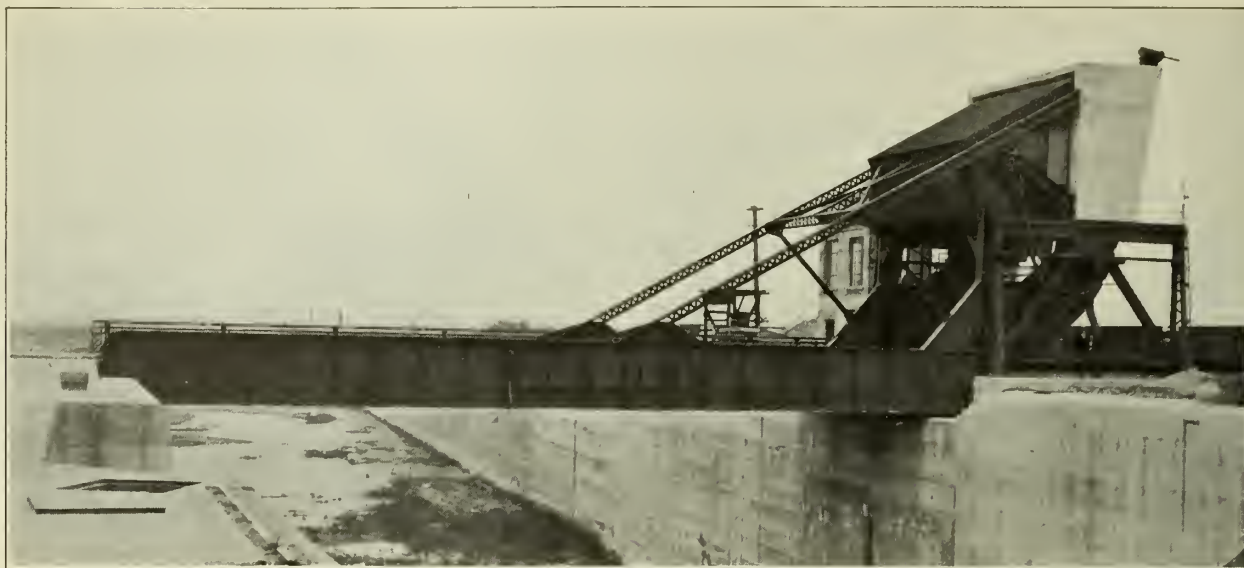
Bridge No. 3—Side View of Bridge Closed.
